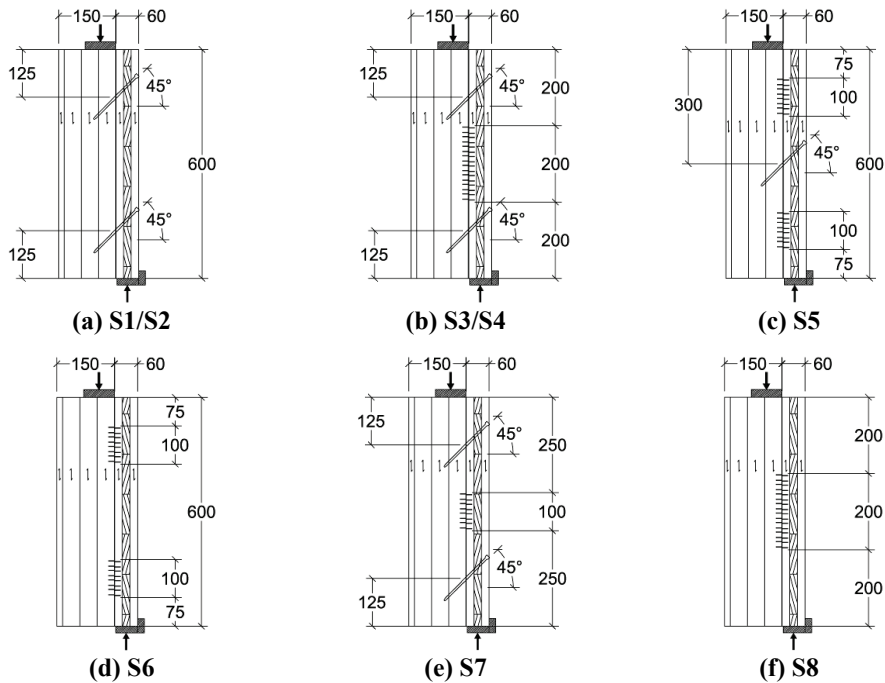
Cross-section of a shear test specimen (dimensions in mm).
